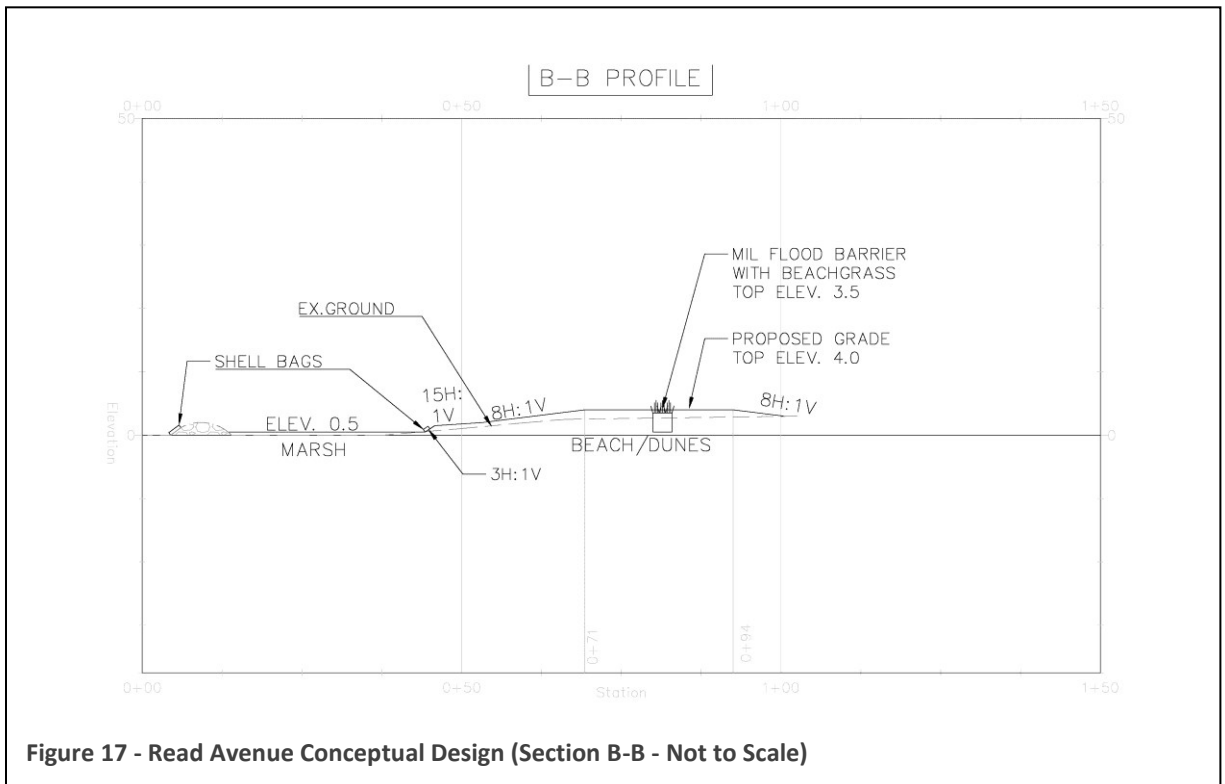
Read Avenue Conceptual Design (Section B-B - Not to Scale)
